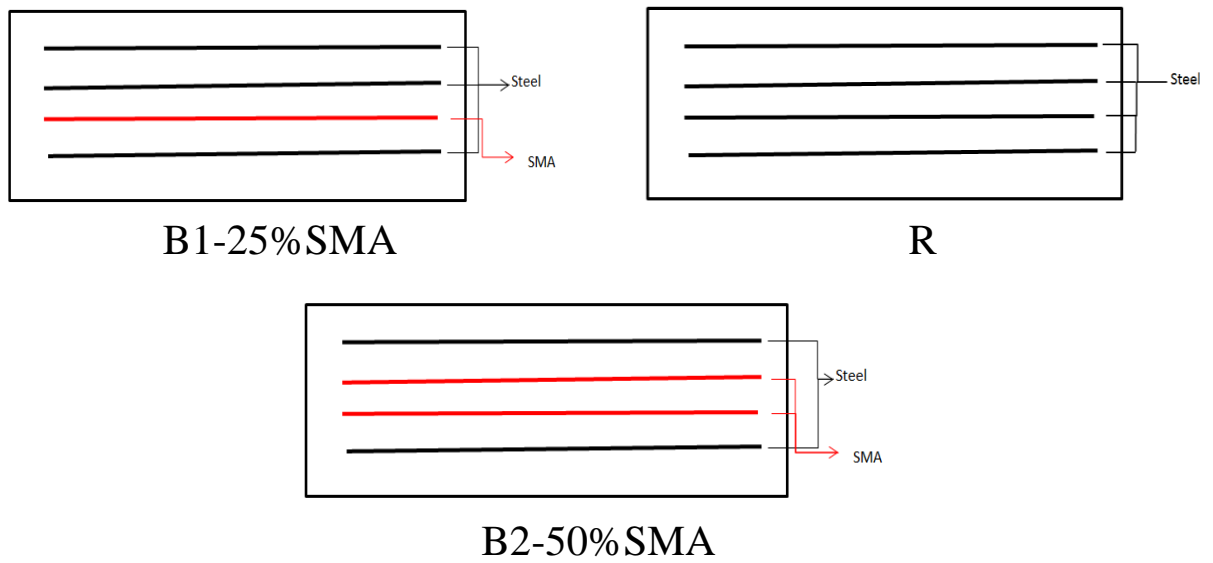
Arrangement of reinforcing the bottom beams in the longitudinal direction
